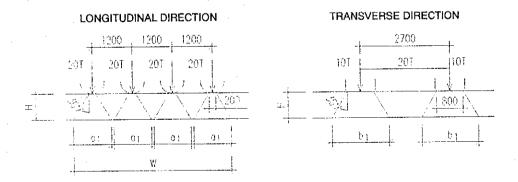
Vietnamese HK-80 loading for Culvert Design
